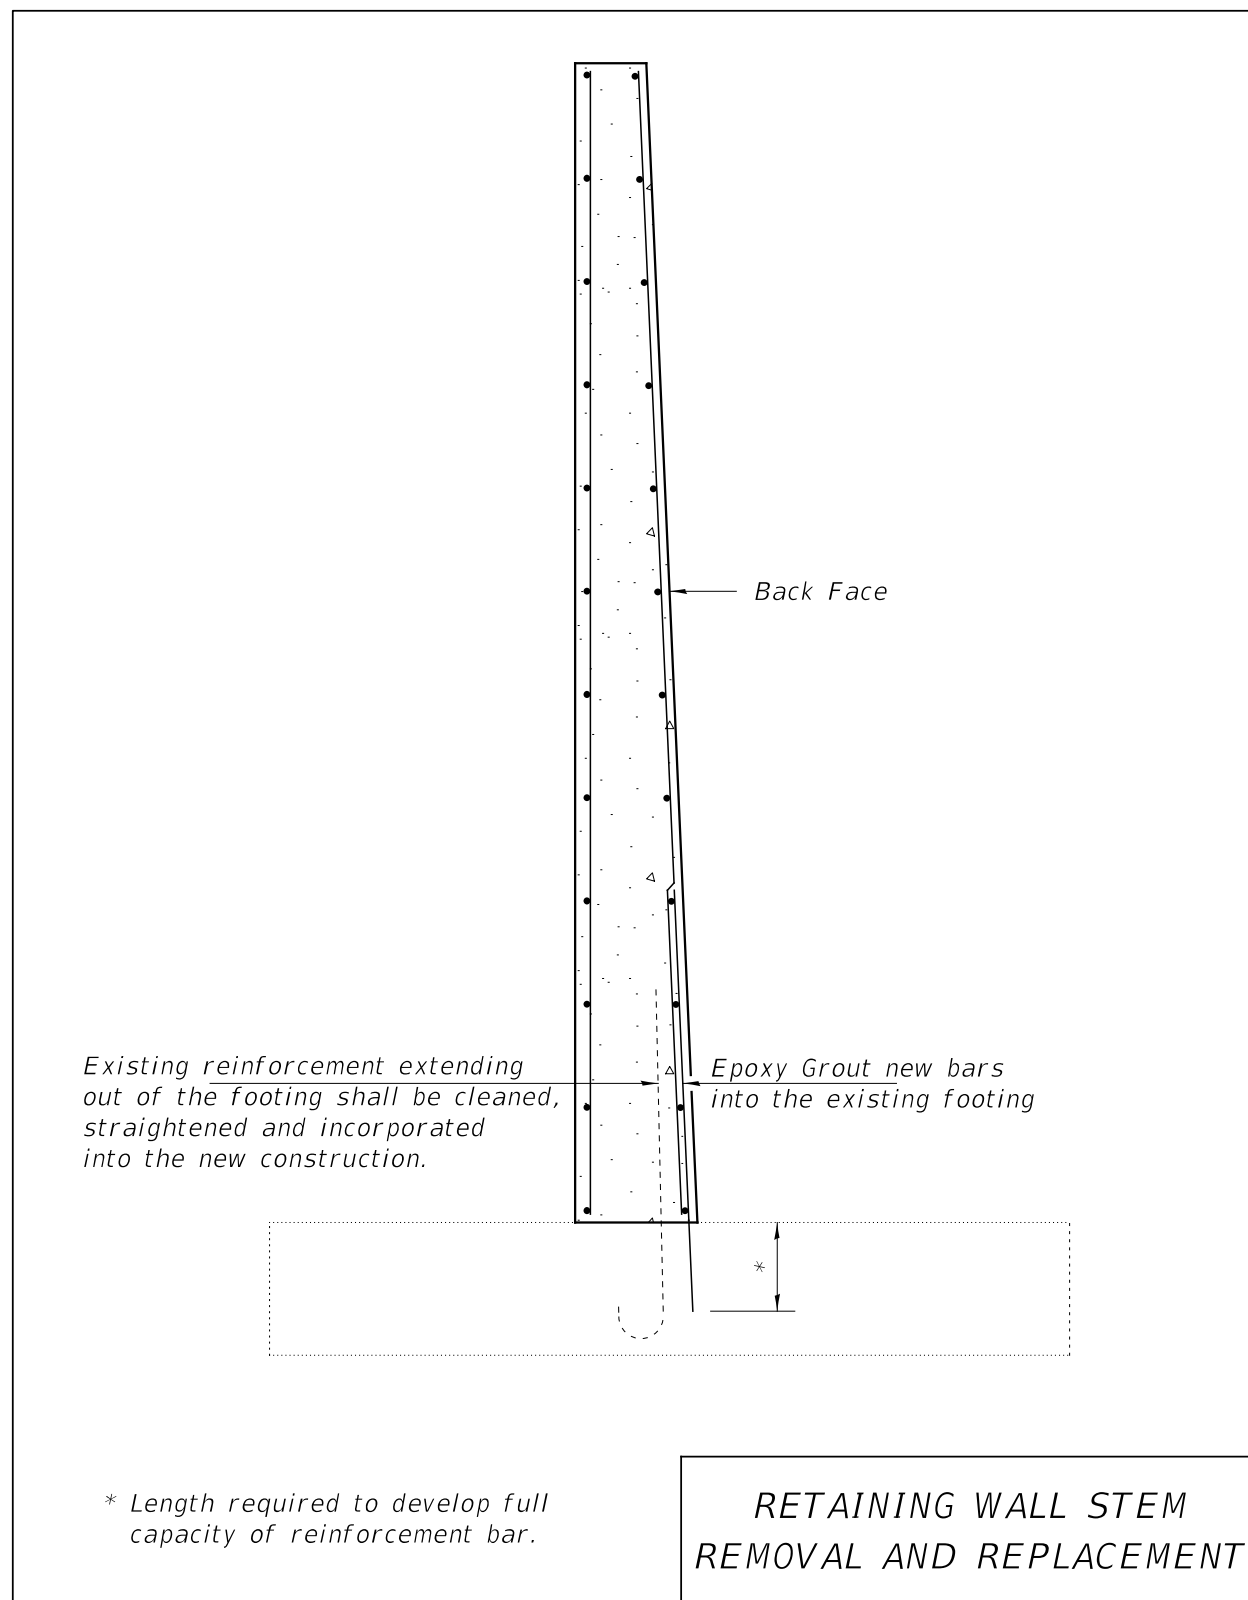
Retaining Wall Stem Removal and Replacement
